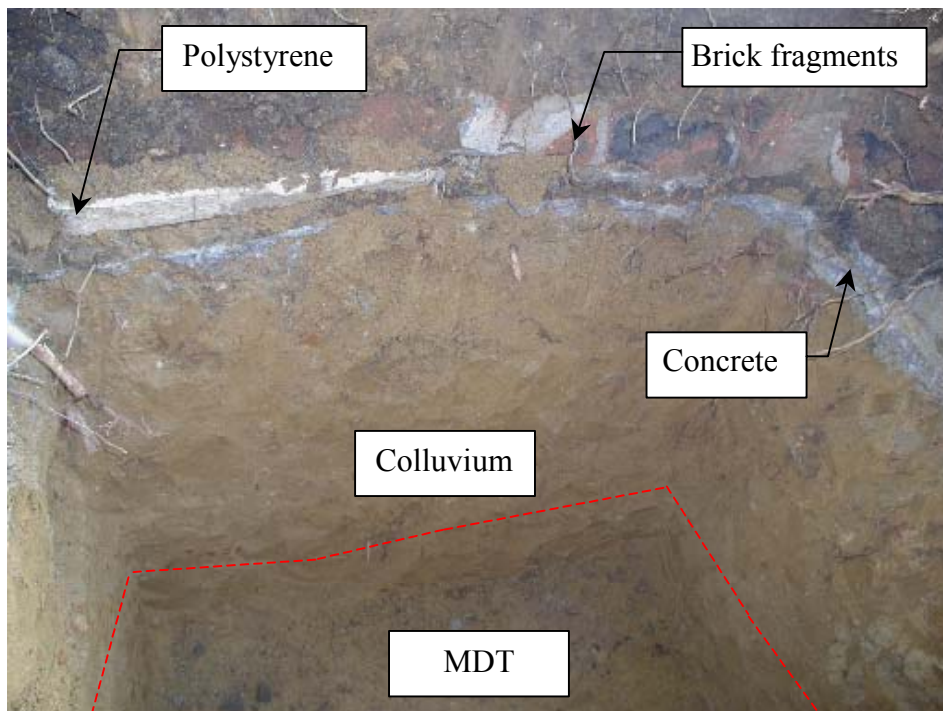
Fill Containing Brick Fragments, Concrete and Polystyrene Exposed in Trial Pit No. TP2
